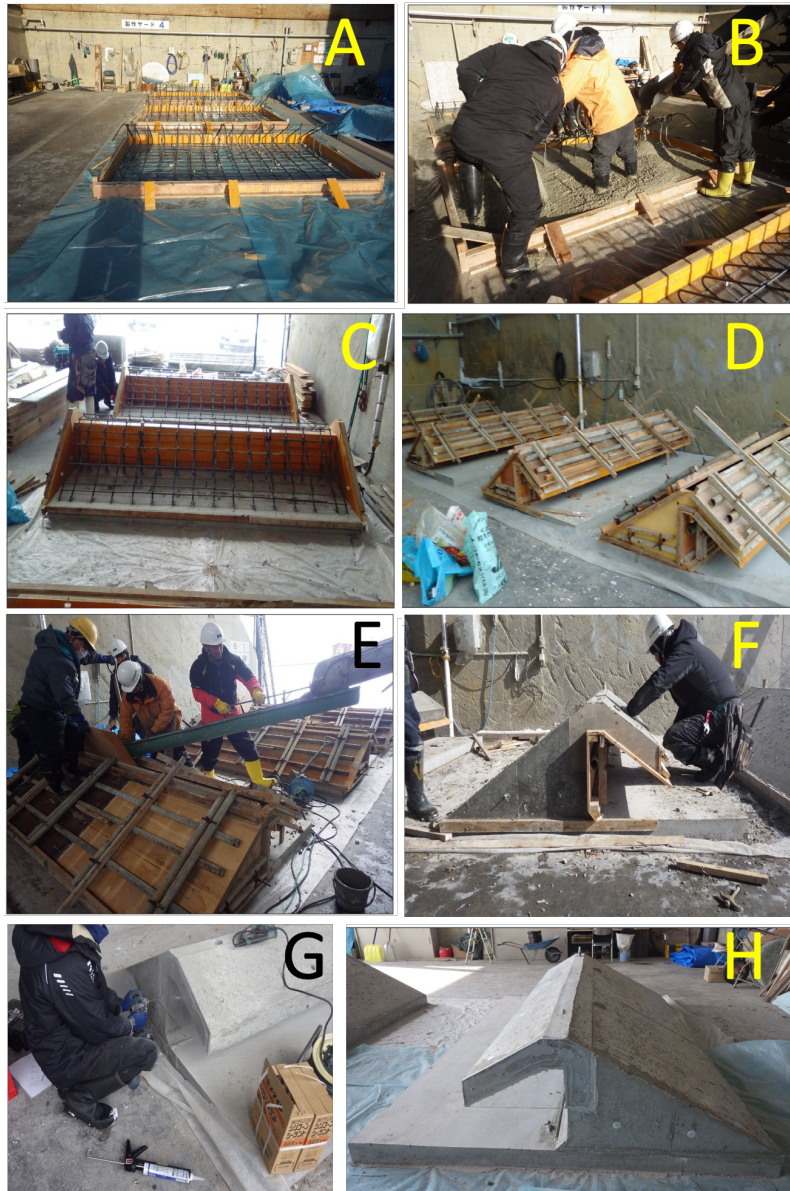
Fabrication of the concrete blocks for culture sea cucumbers. A, assembling the formwork and rebar for the bottom plate; B, injection ready-mixed concrete into the bottom formwork; C, assembling the inside formwork and rebar for the upper section; D, assembling the outside formwork and rebar for the upper section; E, injection ready-mixed concrete into the formwork of upper section; F, dismantling of the formwork's; G, polycarbonate observation window installation; H, the completed concrete block.
